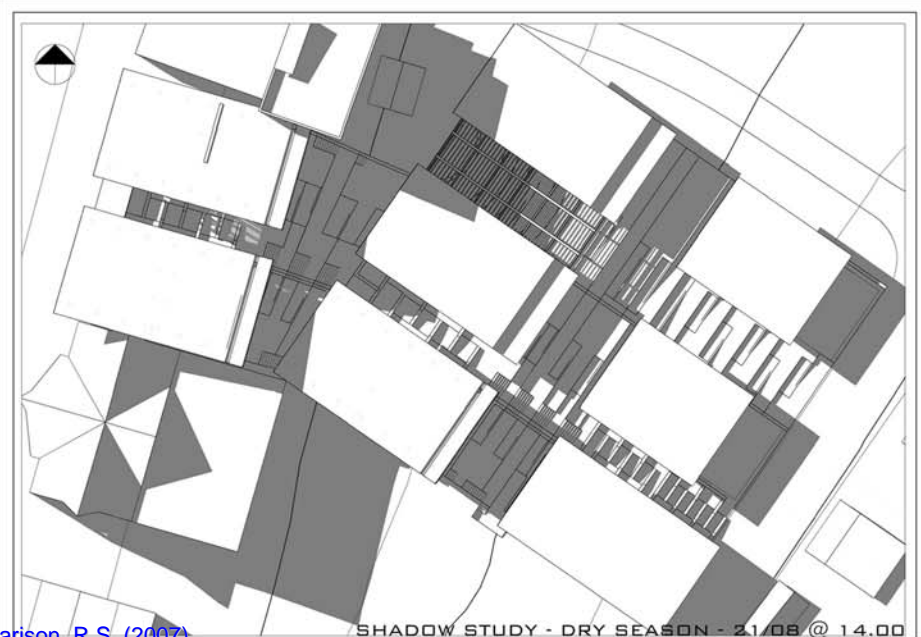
SHADOW STUDY ON 21 AUGUST AT 14.00 - SITE PLAN (AUTHOR, 2006).
